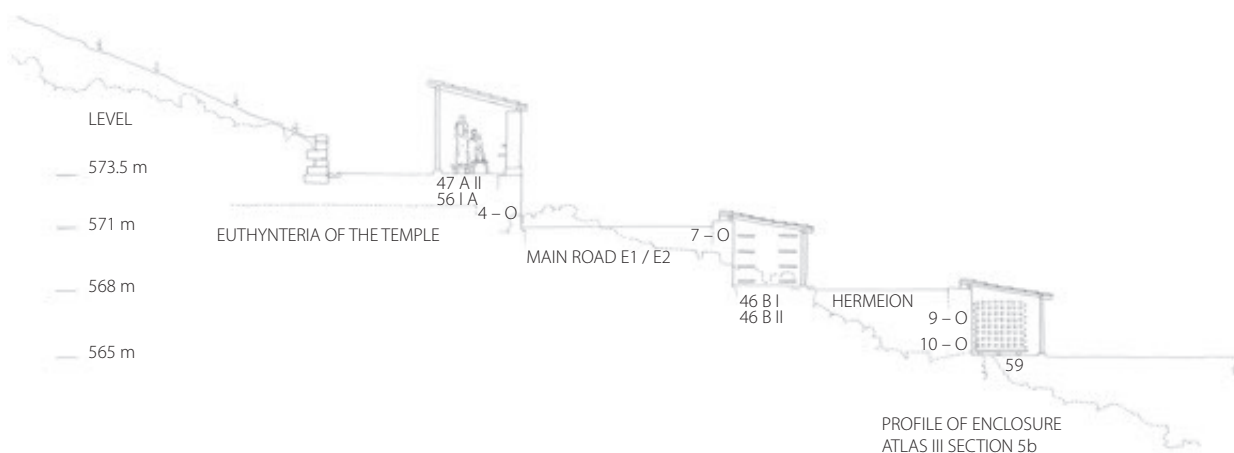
Elevation. East-facing section of canopies and sheds positioned on the terraces above and below the main road, which runs at Level 471. Behind the buildings the profile of the western ring wall is drawn in from the Atlas, section 5b.
